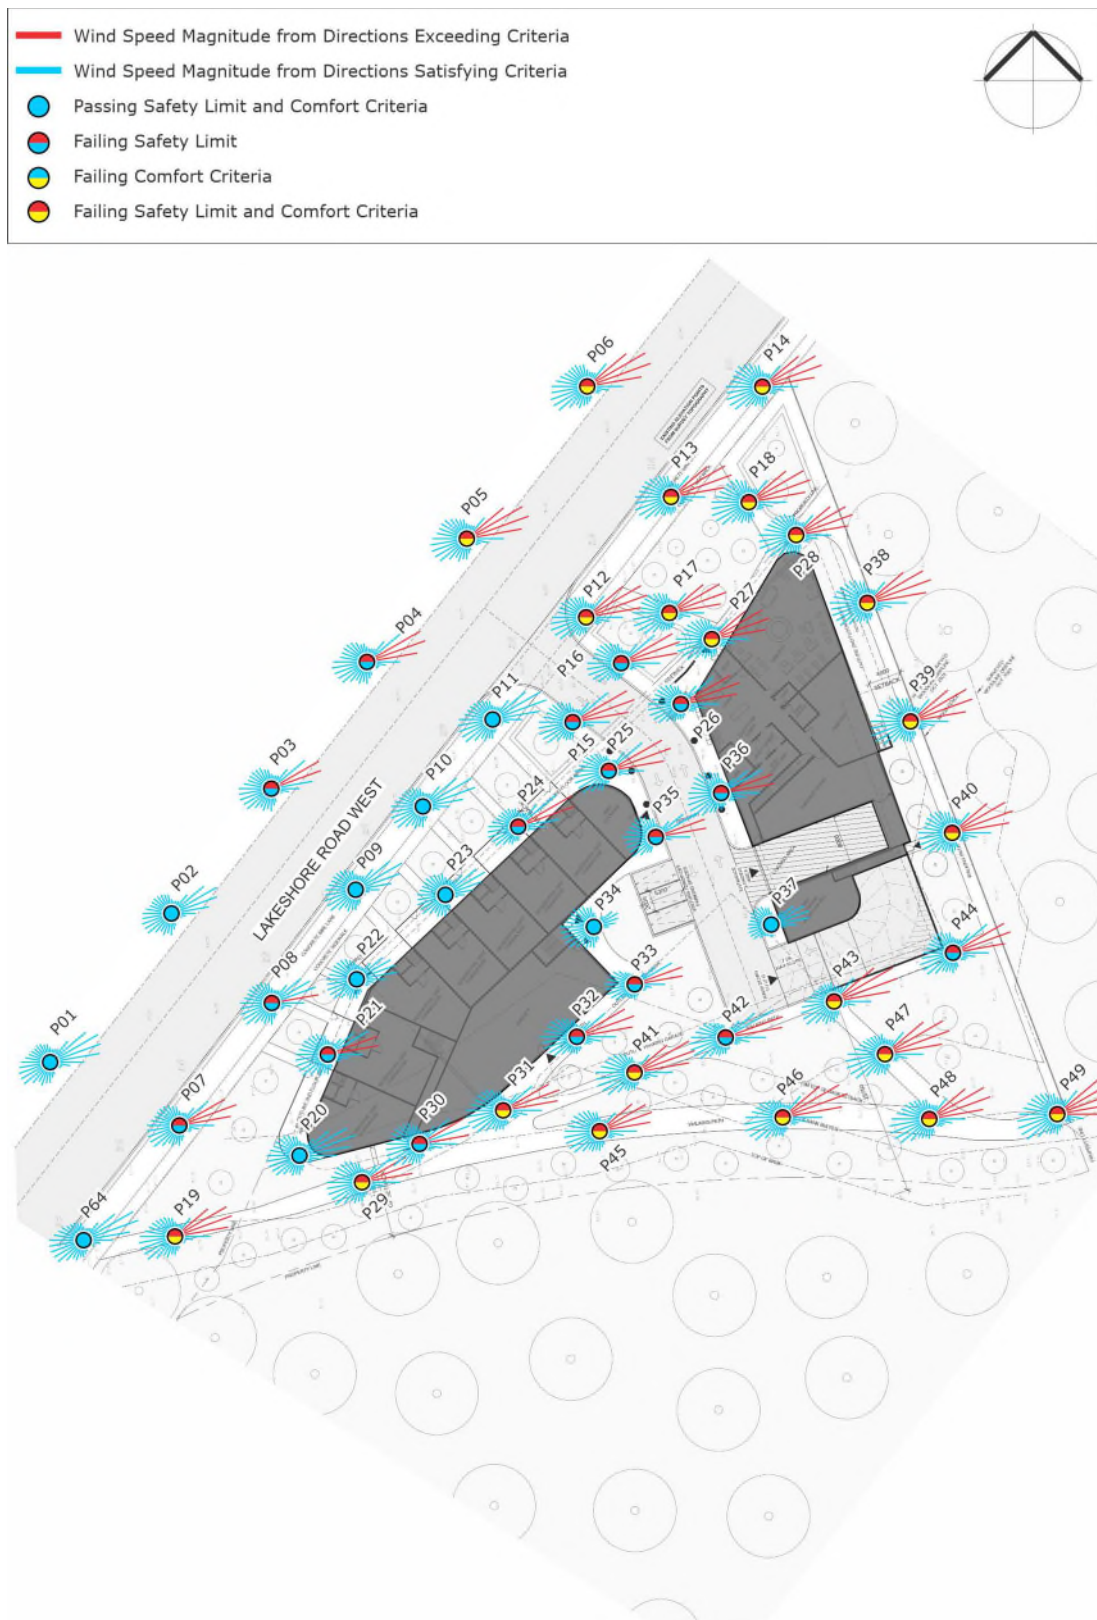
3c: Wind Tunnel Results – Existing Scenario – Winter – Ground Level Plan
